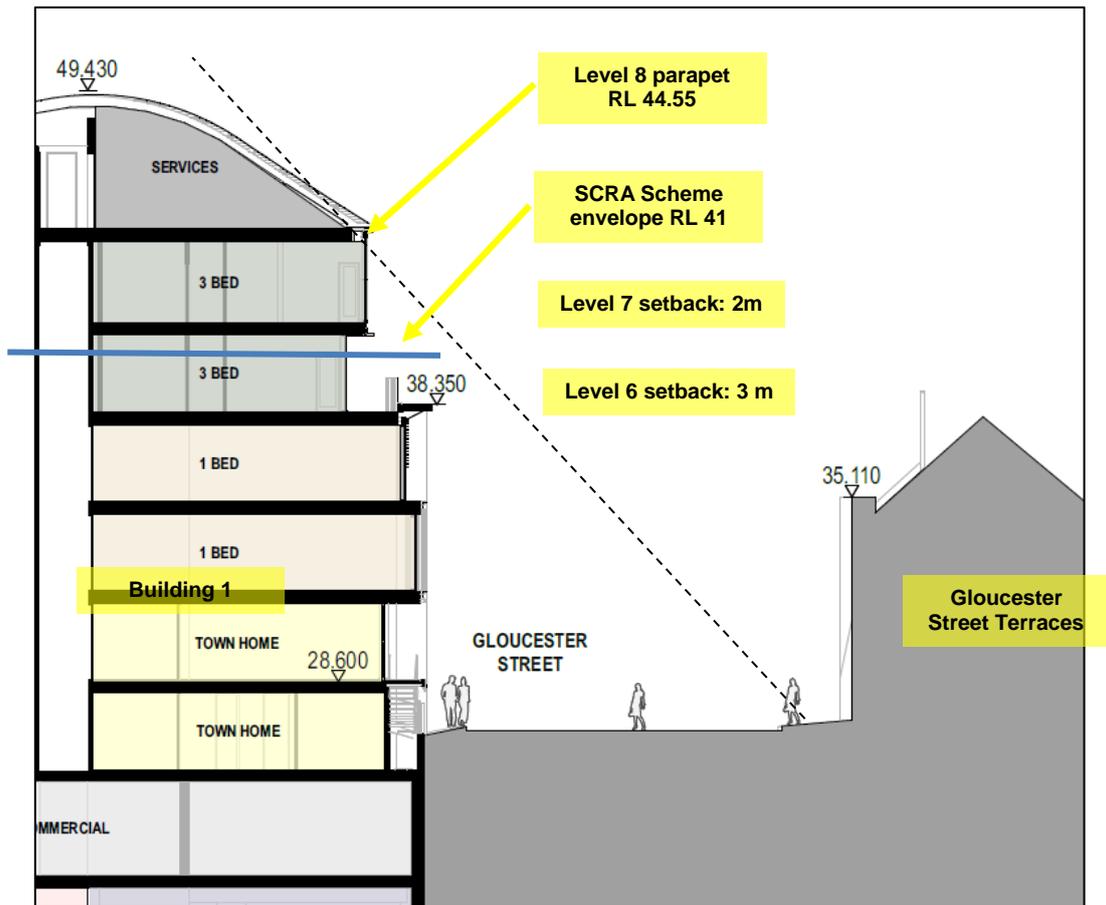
Cross-section of Building 1 to Gloucester Street (Source: Architectural Plans)
